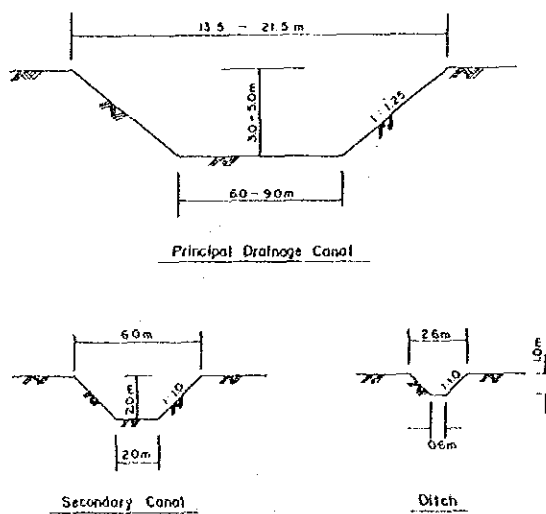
Present Cross section of drainage Canal in Banana Plantation
